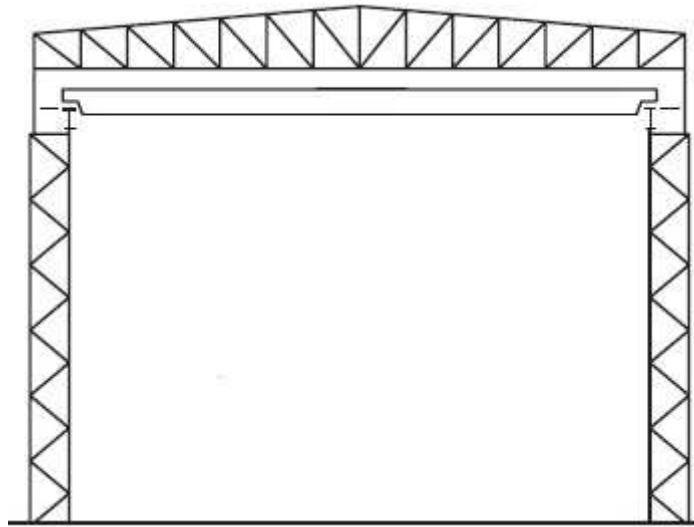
Typical industrial frame with laced built-up columns carrying crane bridge
